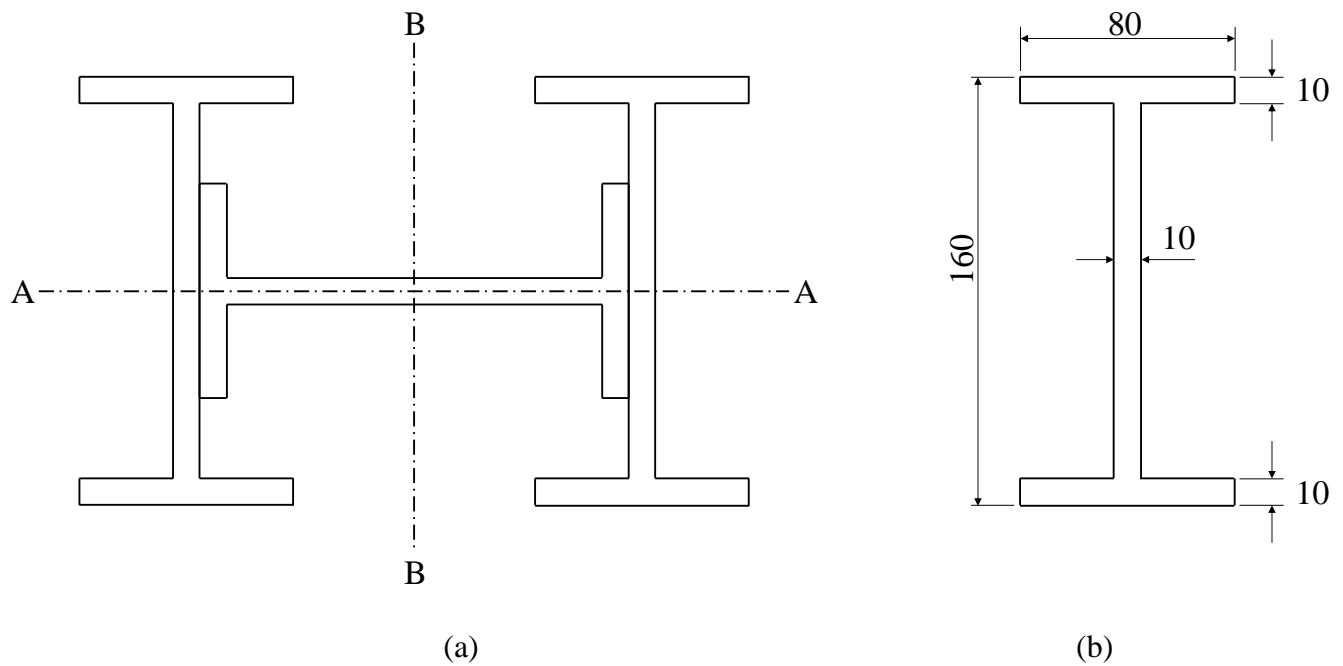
(a) Assembled compound cross-section and (b) dimensions of each component I-section (in millimetres).
